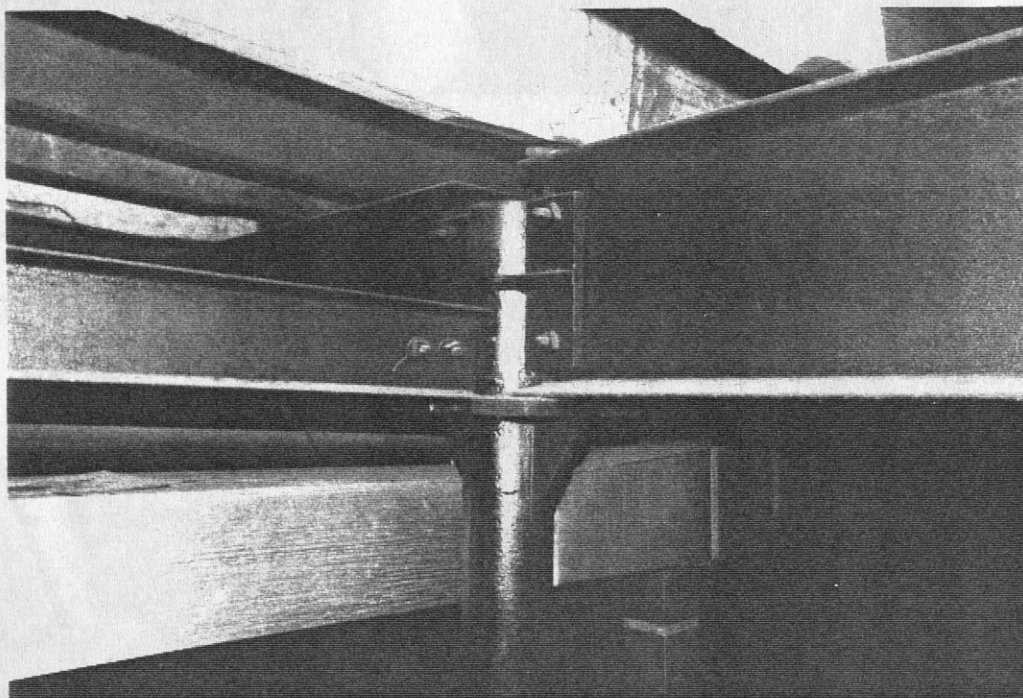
Cast Iron Column in the Oldest Part of Building F
